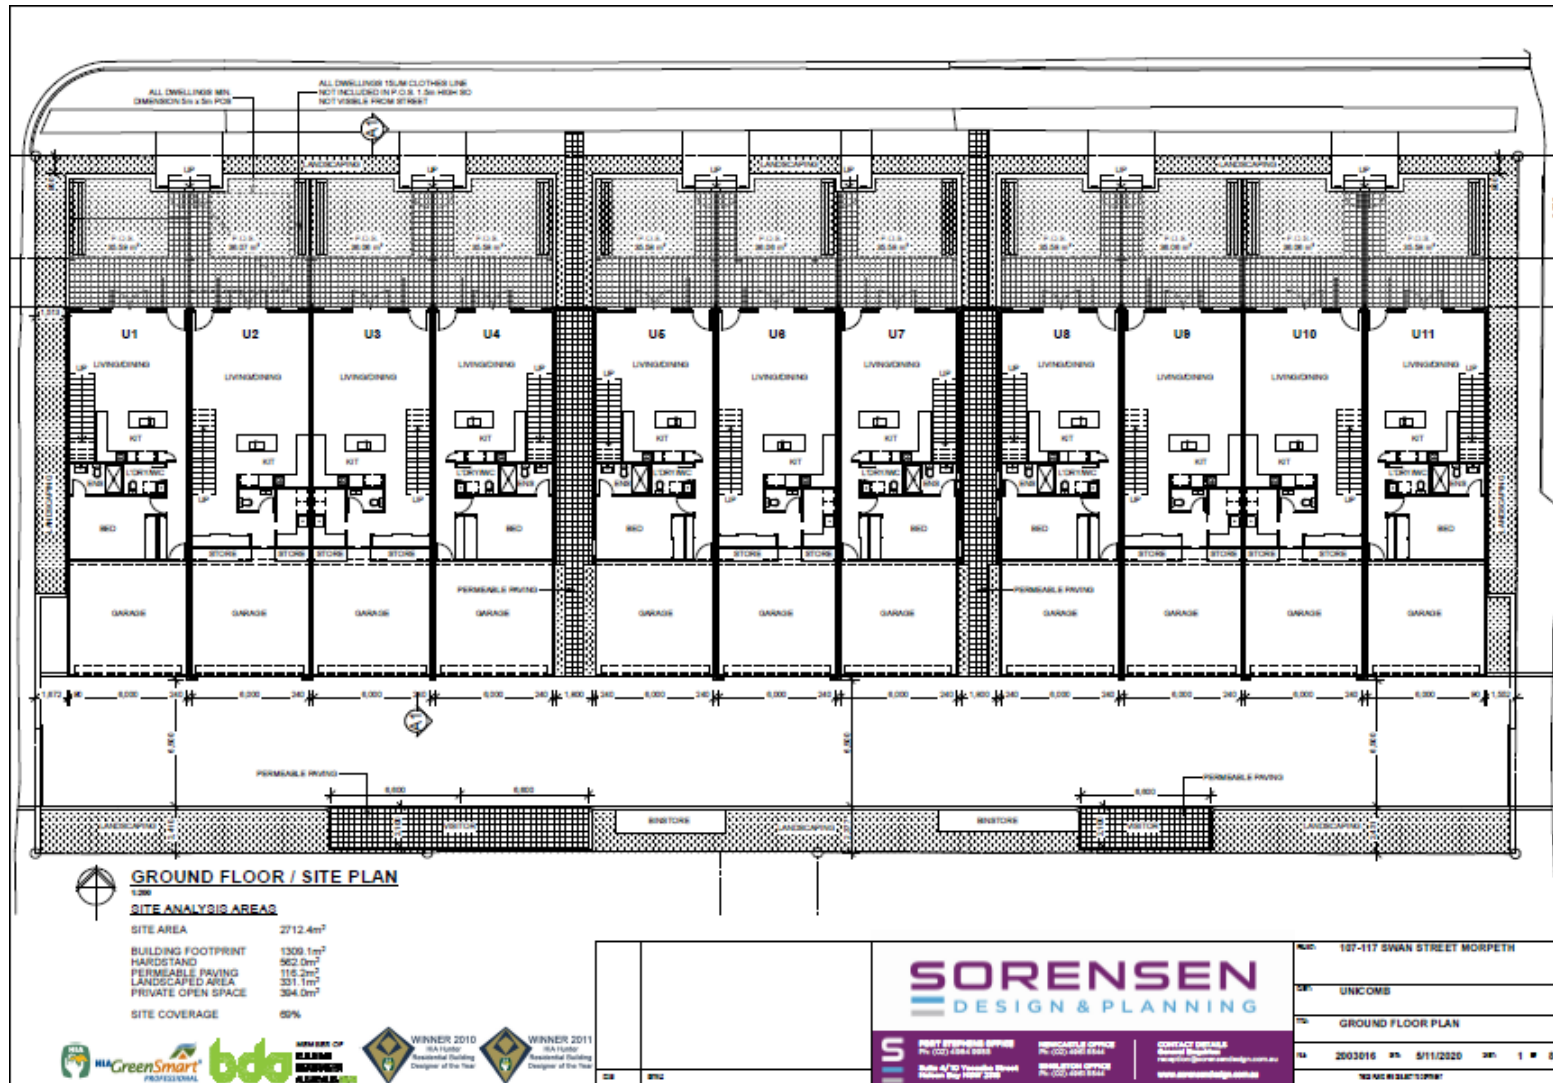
Ground level layout of proposed residential development (Source: Sorensen Design & Planning, File No. 2003016, dated 5/11/2020)
